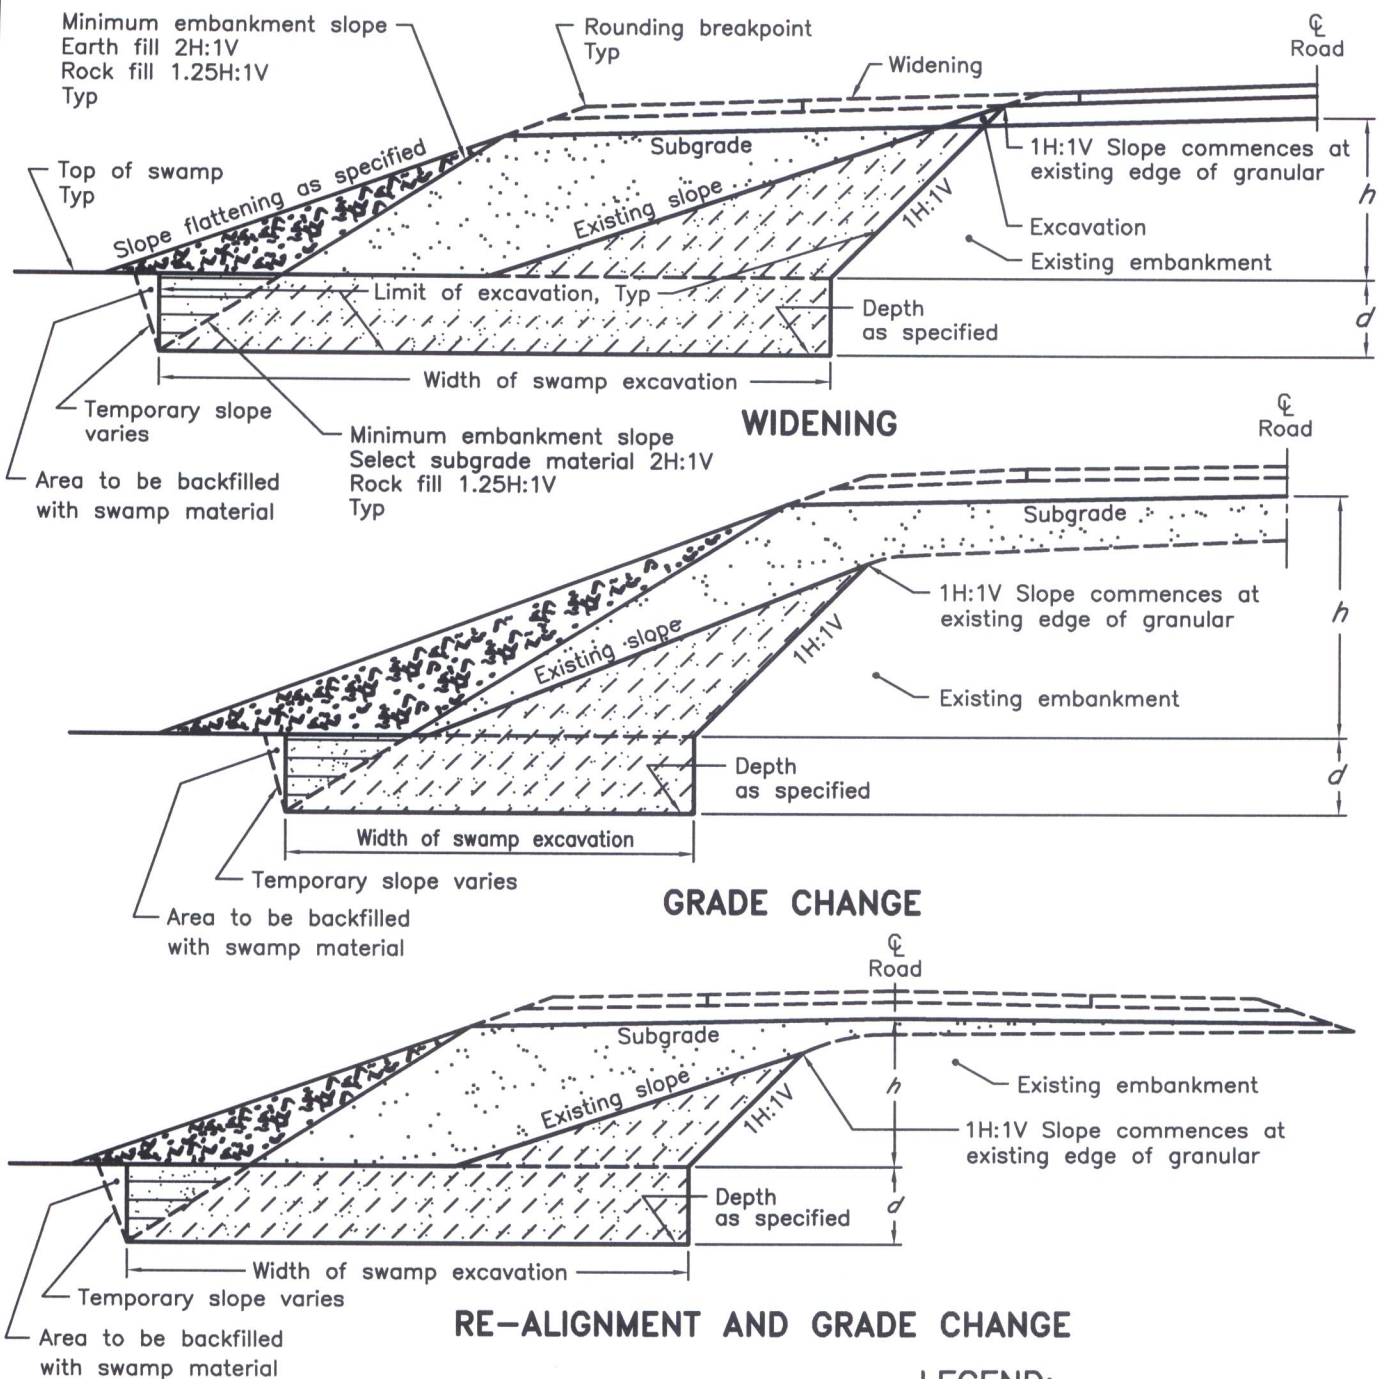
Typical Proposed Cross-Sections for Swamp No. 3
